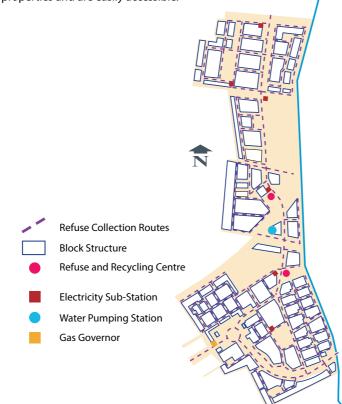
Recycling Facilities & Utilities Infrastructure location plan
